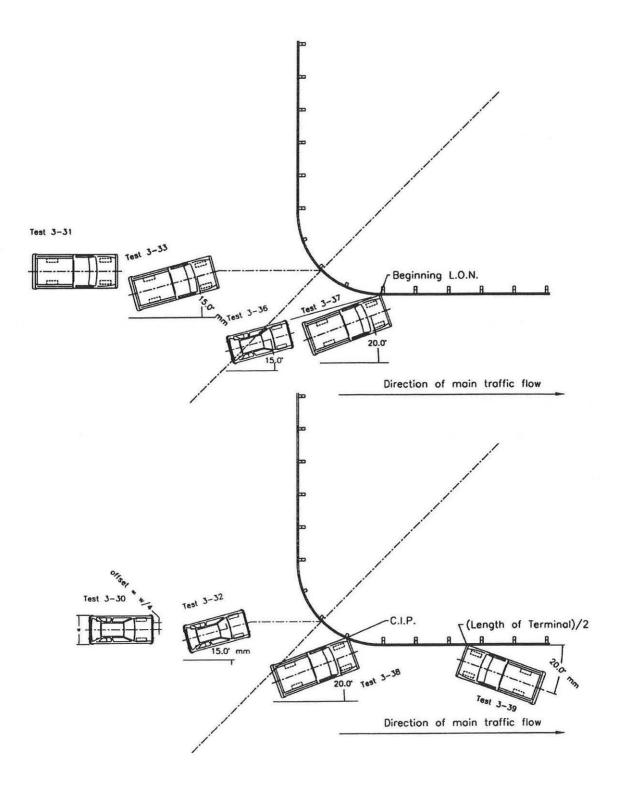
Proposed Full-Scale Crash Tests For Short-Radius Guardrail Evaluation
